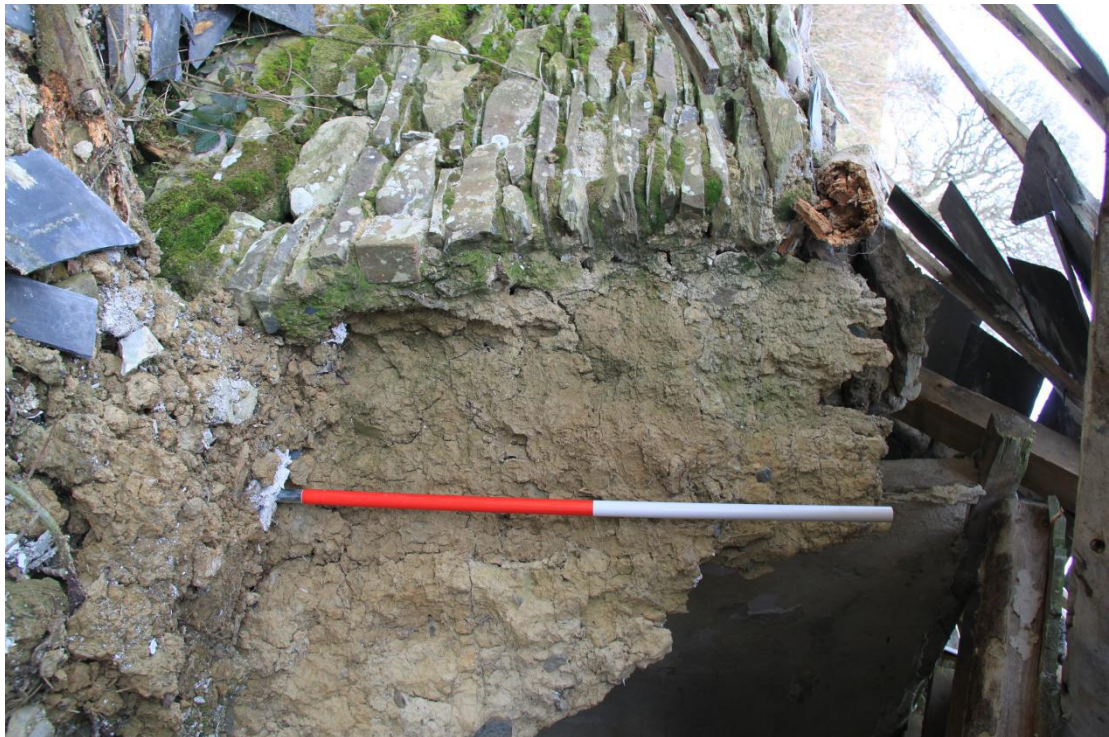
AD004-BR-014 - Joint between stone and clom in west lateral wall.
